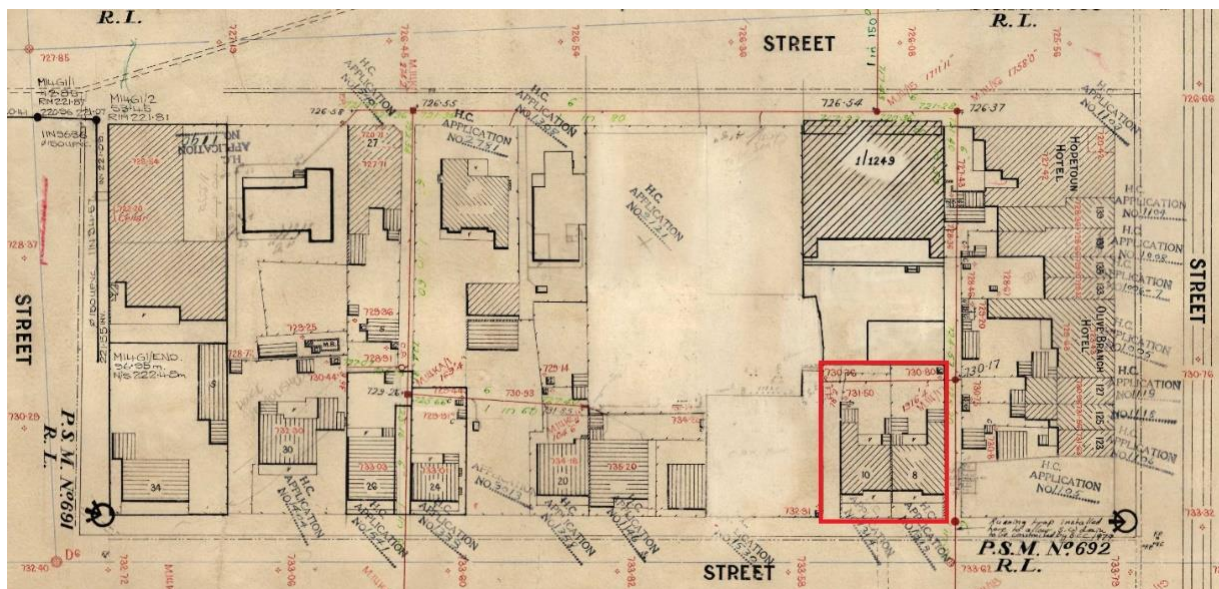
8–10 Garsed Street (outlined in red) shown on 1923 Bendigo Sewerage Authority Plan. (Source: Bendigo Sewerage Authority Detail Plan No. 39, 1923)
